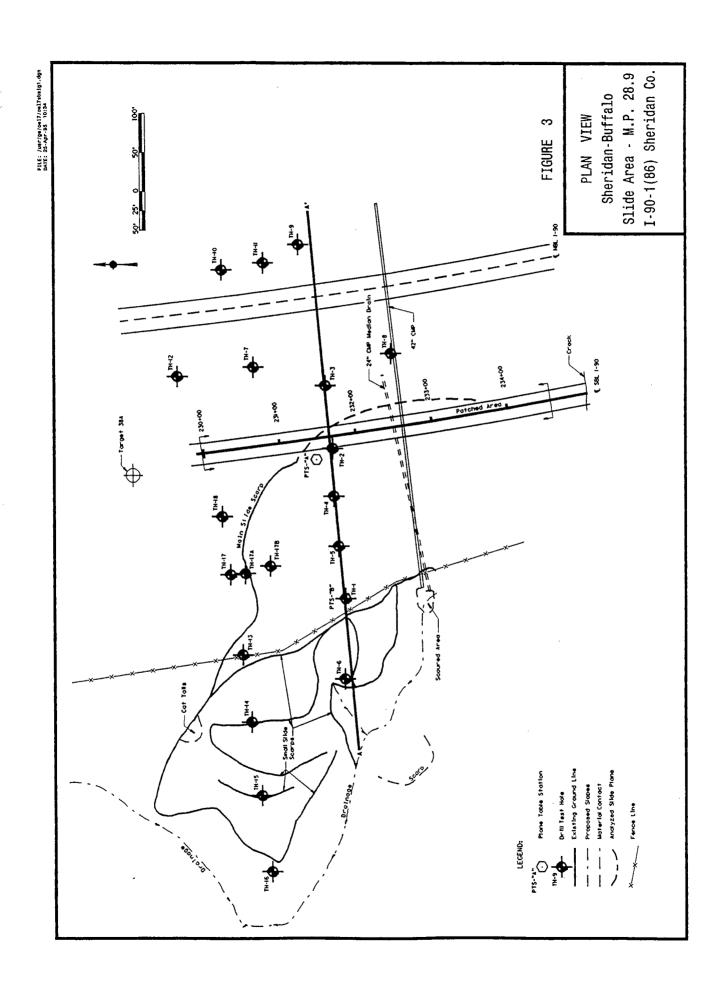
is a plan view of the test hole locations with the outline of the slide limits shown. The greatest amount of visible surface movement was evident along the north side of the drainage near the outlet end of the 42" CMP. In this area there were numerous new surface slumps and the right-of-way fence had been replaced because the movement of the slide had displaced it.
